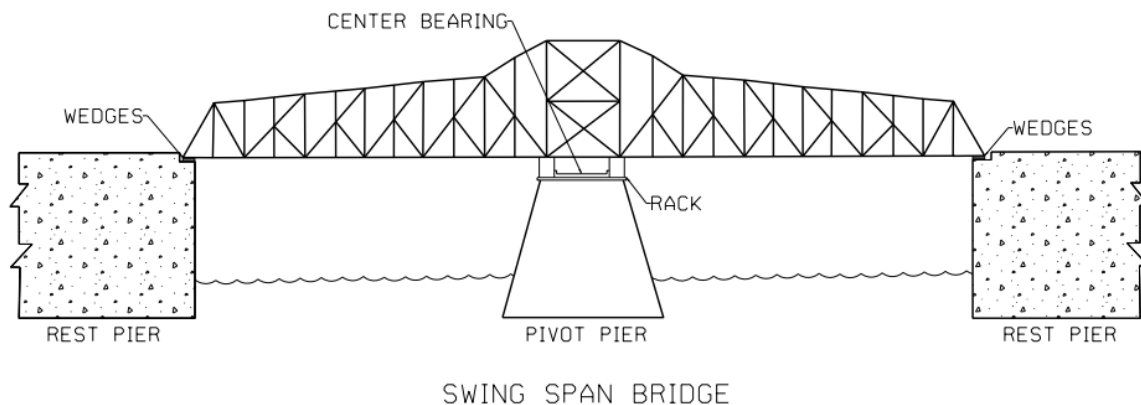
Swing span bridge in closed position showing piers and location for operating components.
